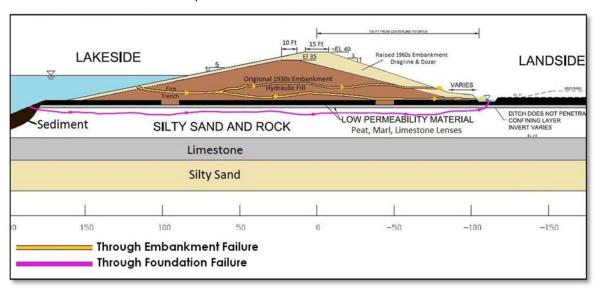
Typical failure mode paths for internal erosion through embankment and through foundation. This figure also shows typical geology around the southern half of the dam as well as the cross section of the 2 construction eras (i.e. 1930s regional construction and the 1960s raising and widening of the embankment).
